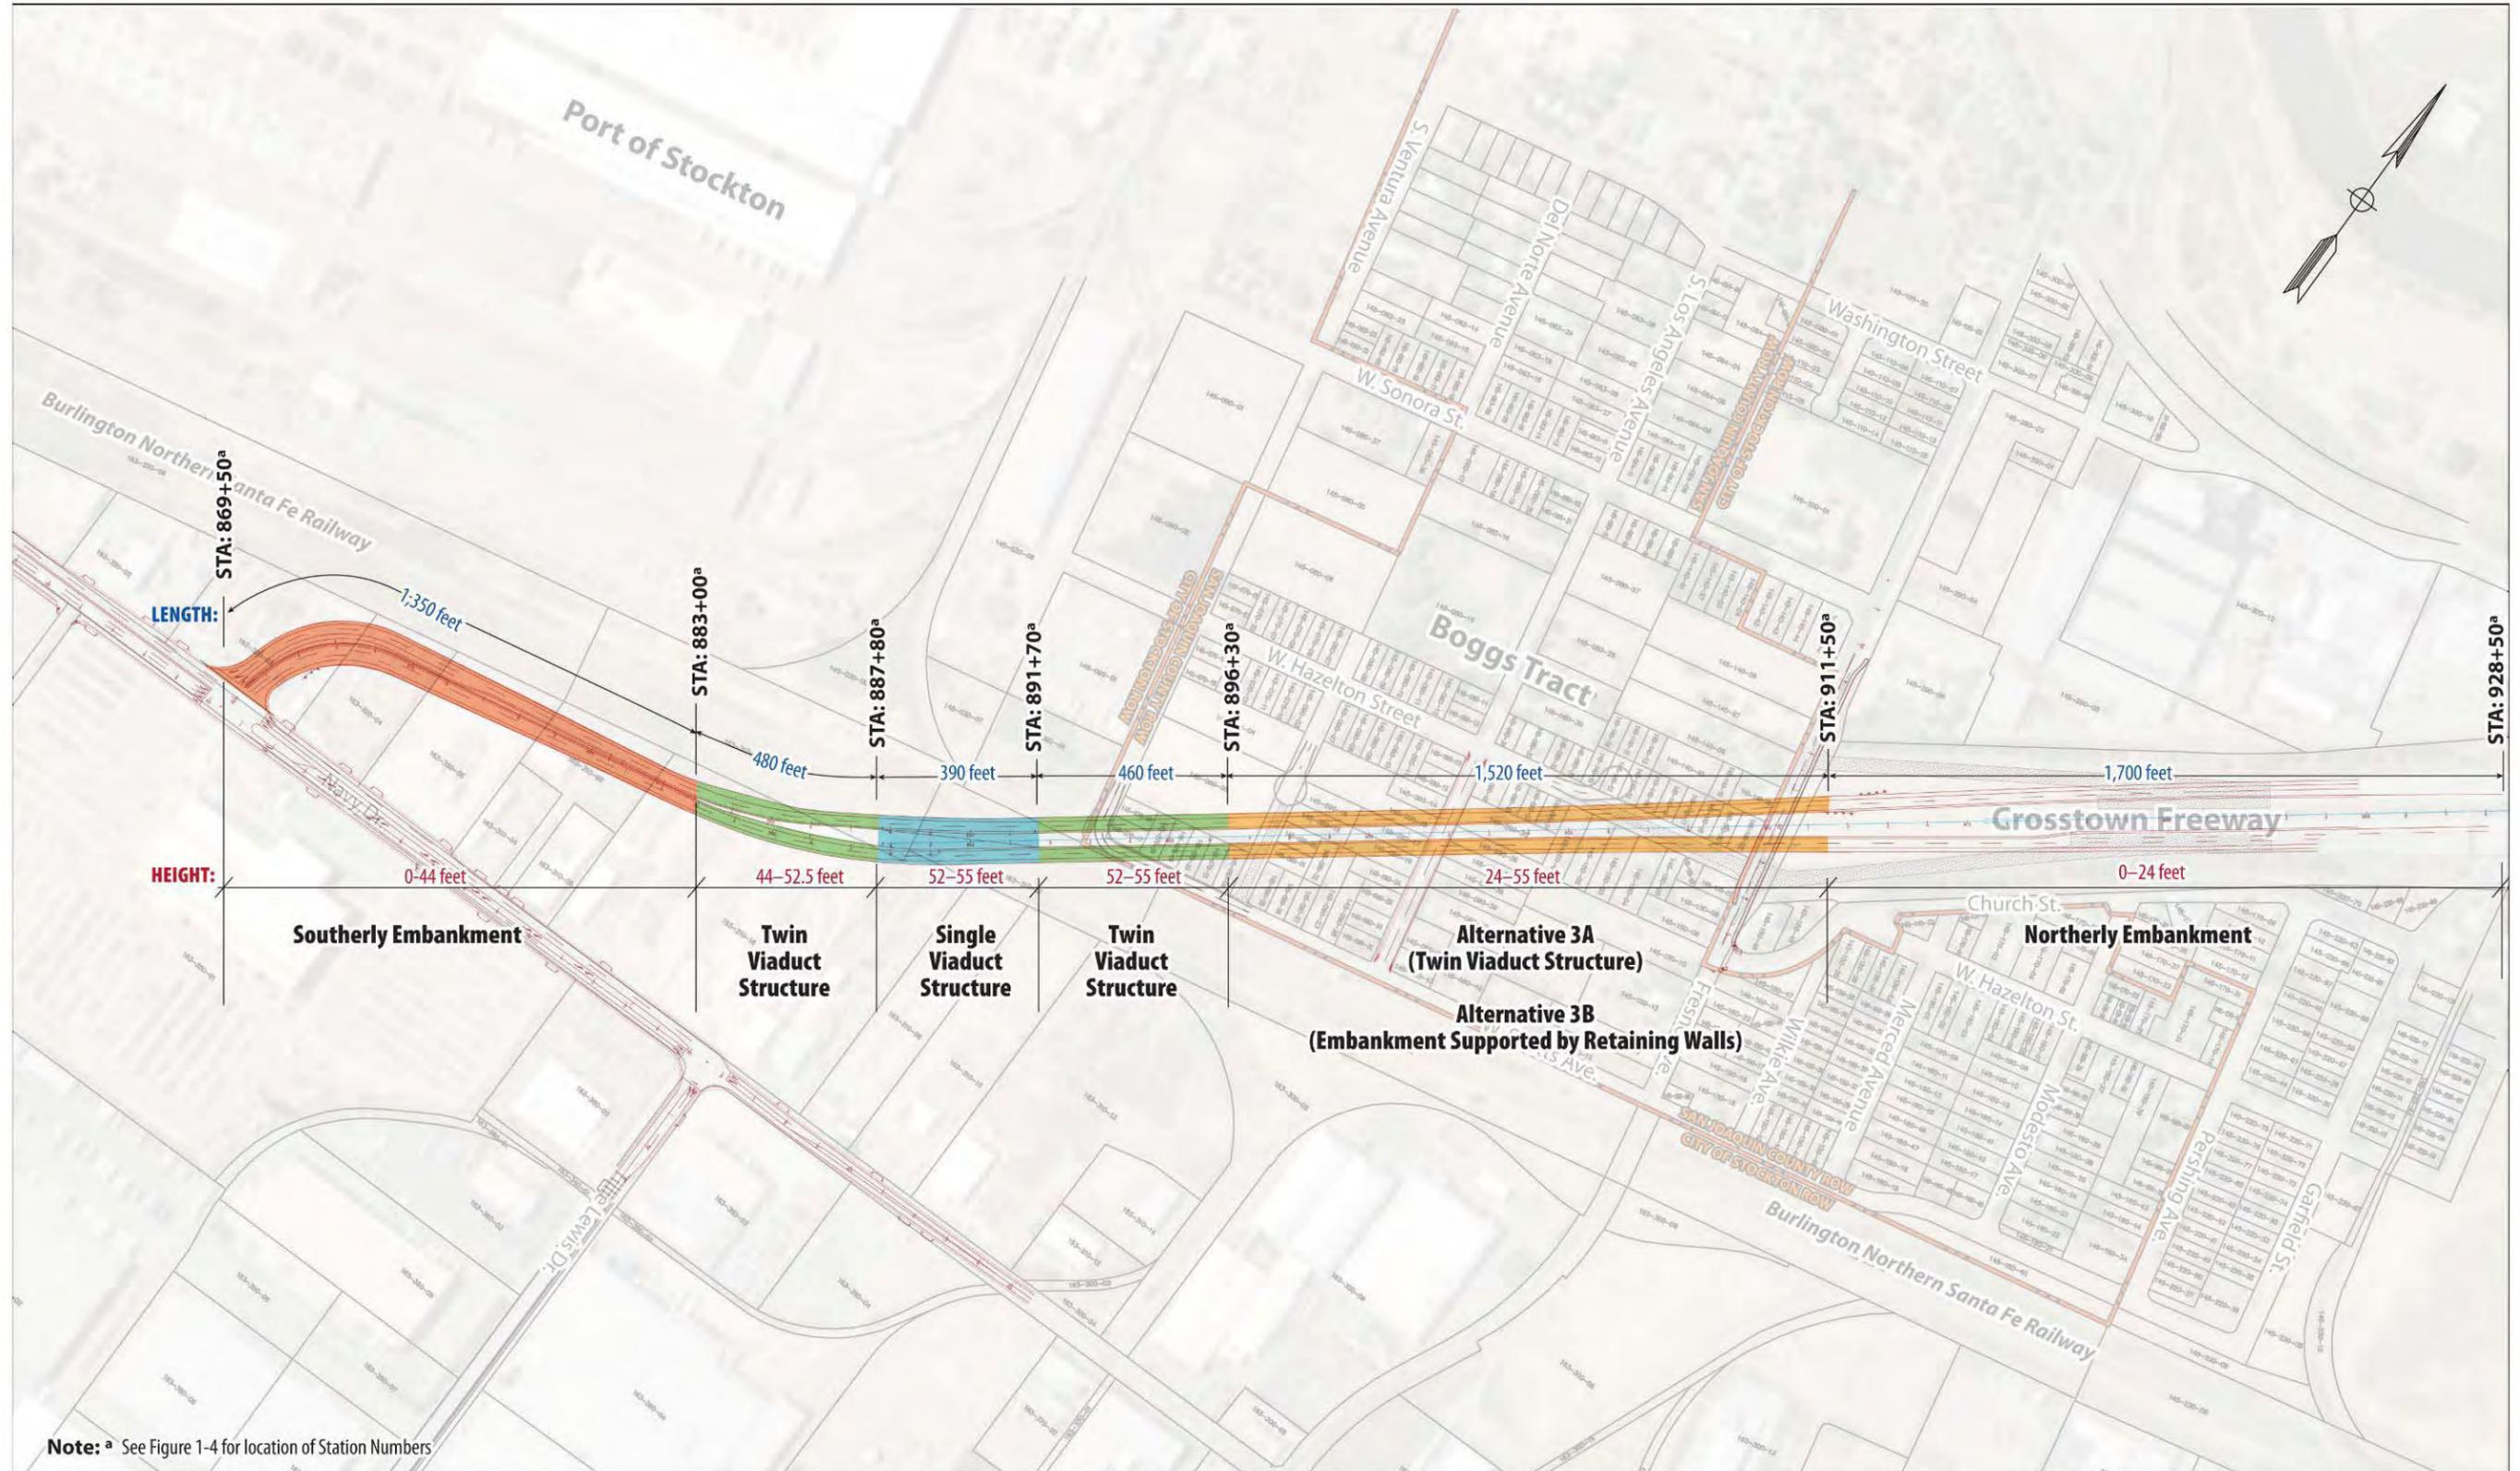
Schematic of Proposed Elevated Structure and Embankments
